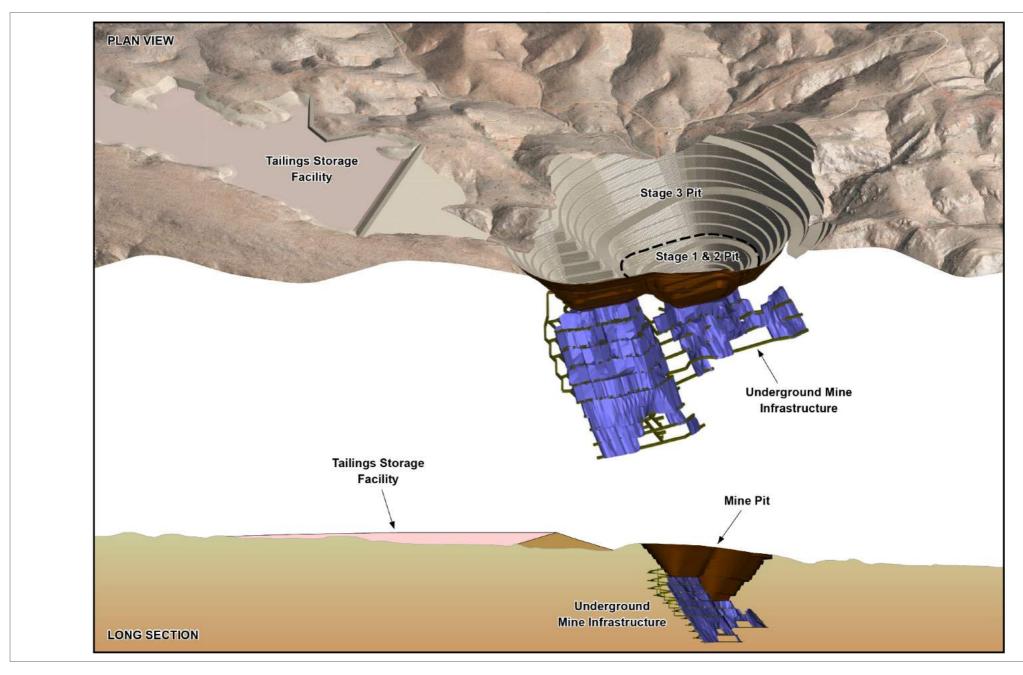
Site of Proposed Pit Centres on Sulphur Springs Creek
